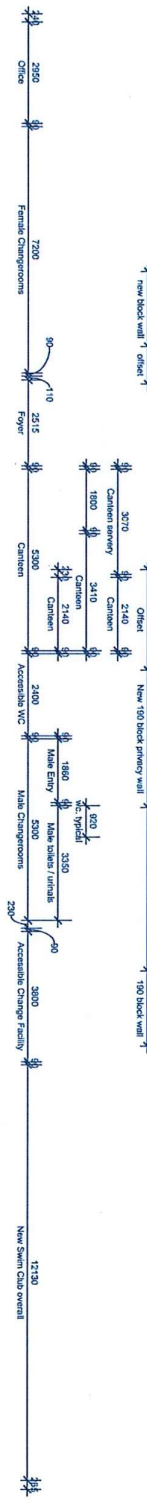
is a sectional elevation of the proposed swimming club. The diagram shows a cross-section of a building with various rooms and structural elements. Key features include:
